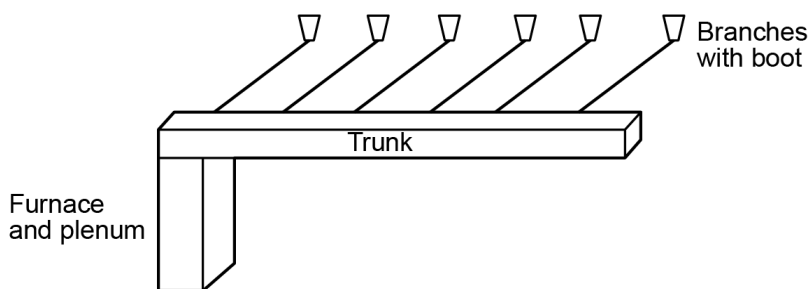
Trunk and branch (one-way system). (Skilled Trades BC, 2021) Used with permission.
